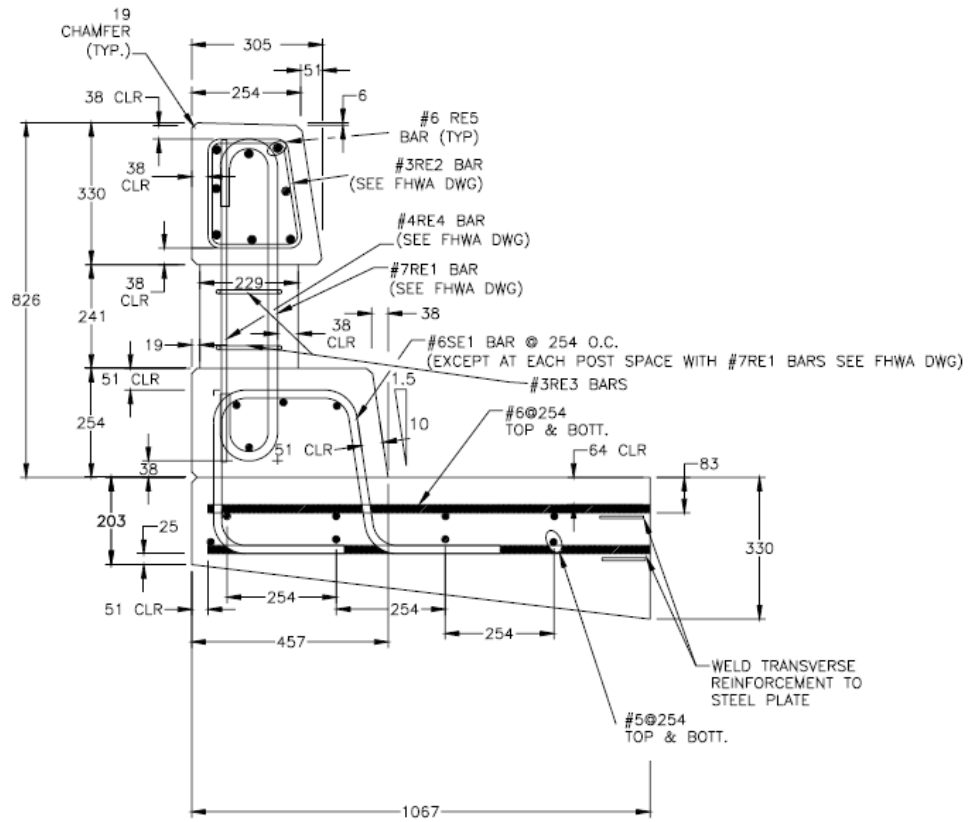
Natchez Trace Bridge Rail Design Details, Test Nos. 405181-11 and 405181-12 (dimensions in mm) [4]
